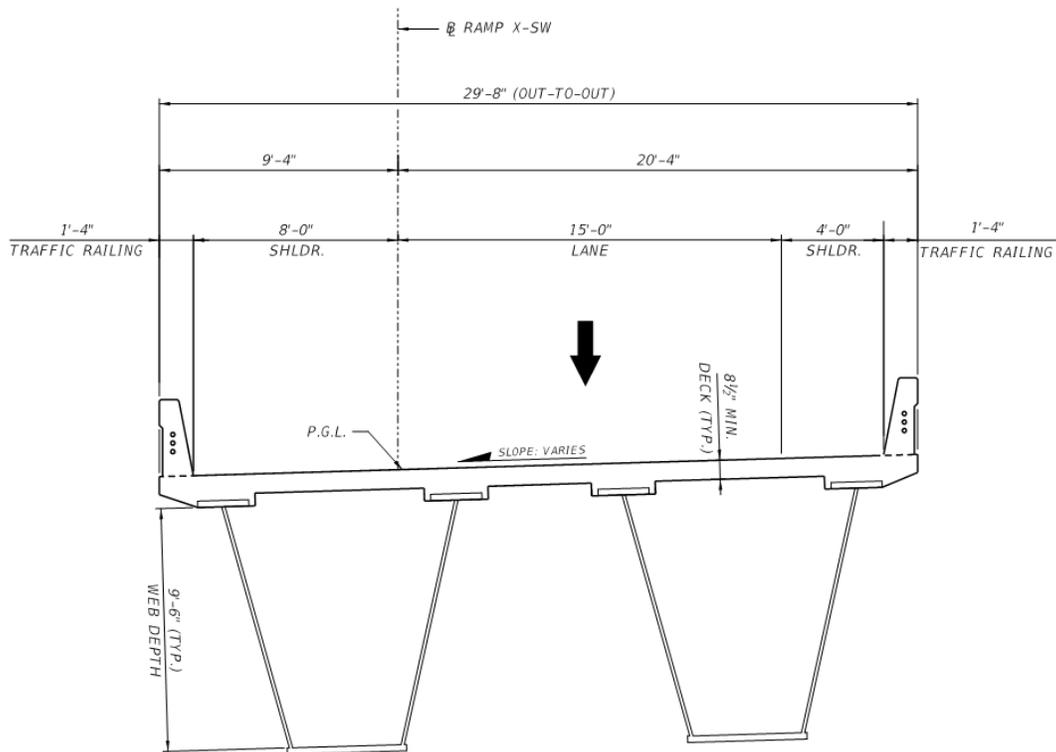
Bridge Typical Section (Bridge No. 2)
